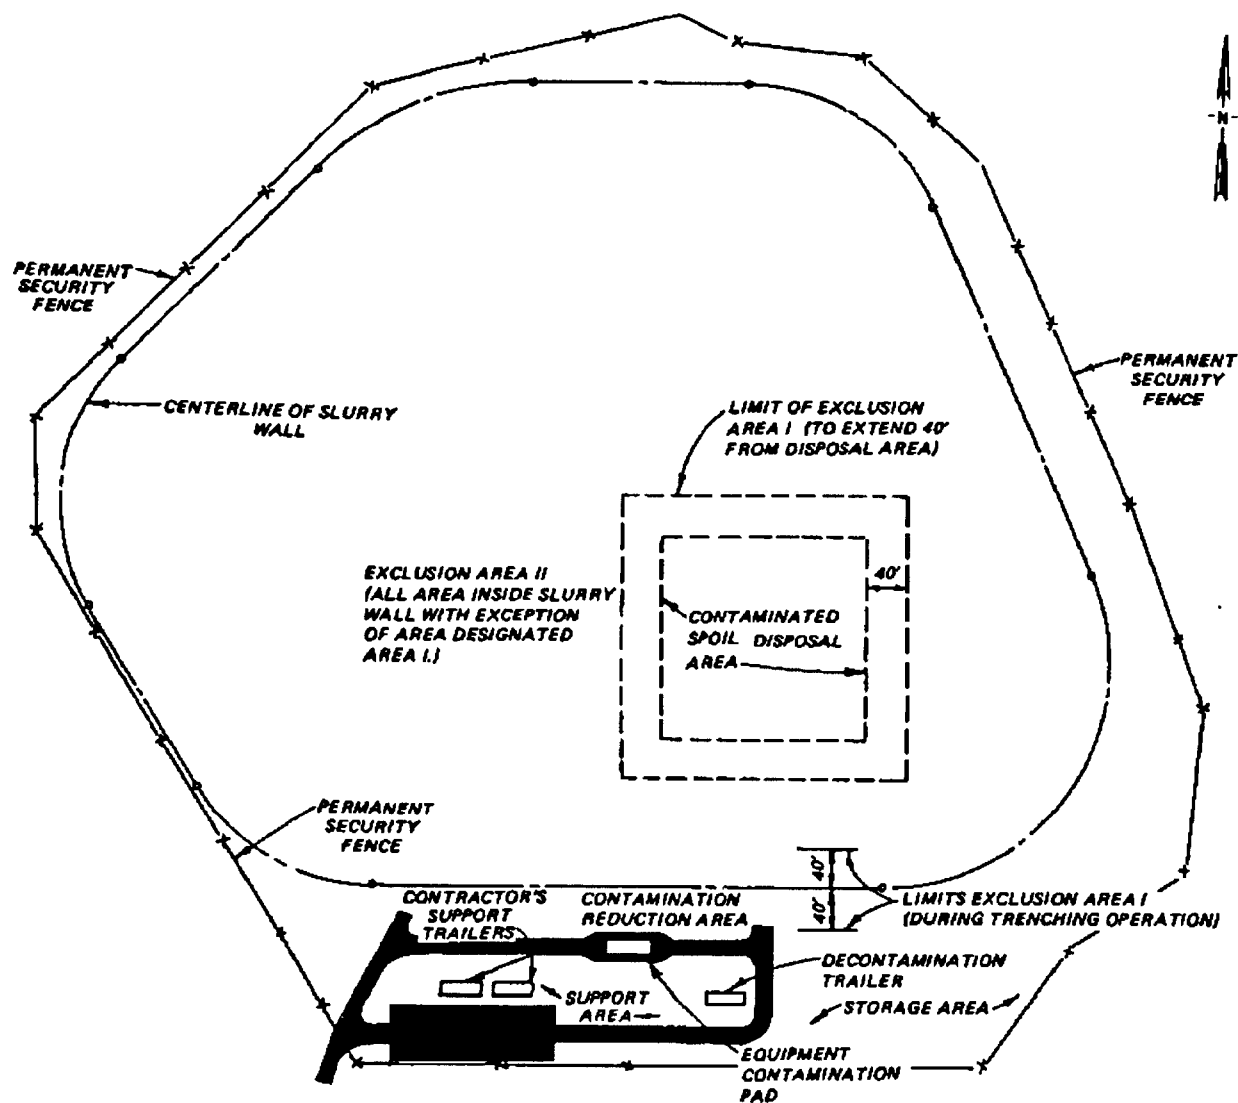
Design Drawing for Lipari Landfill Slurry-Trench Cutoff Wall
